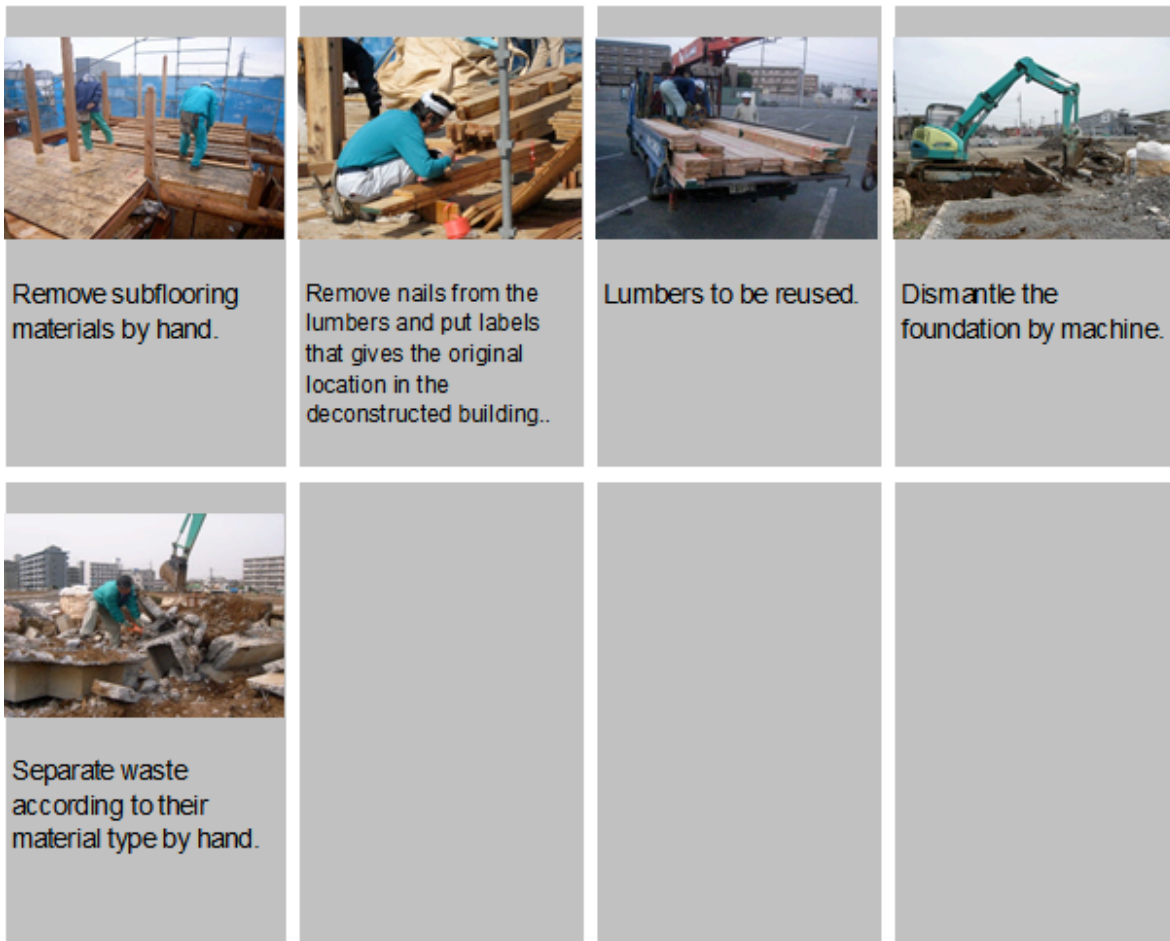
Outline of the of the deconstruction method of post and beam timber houses. (Part 3)
